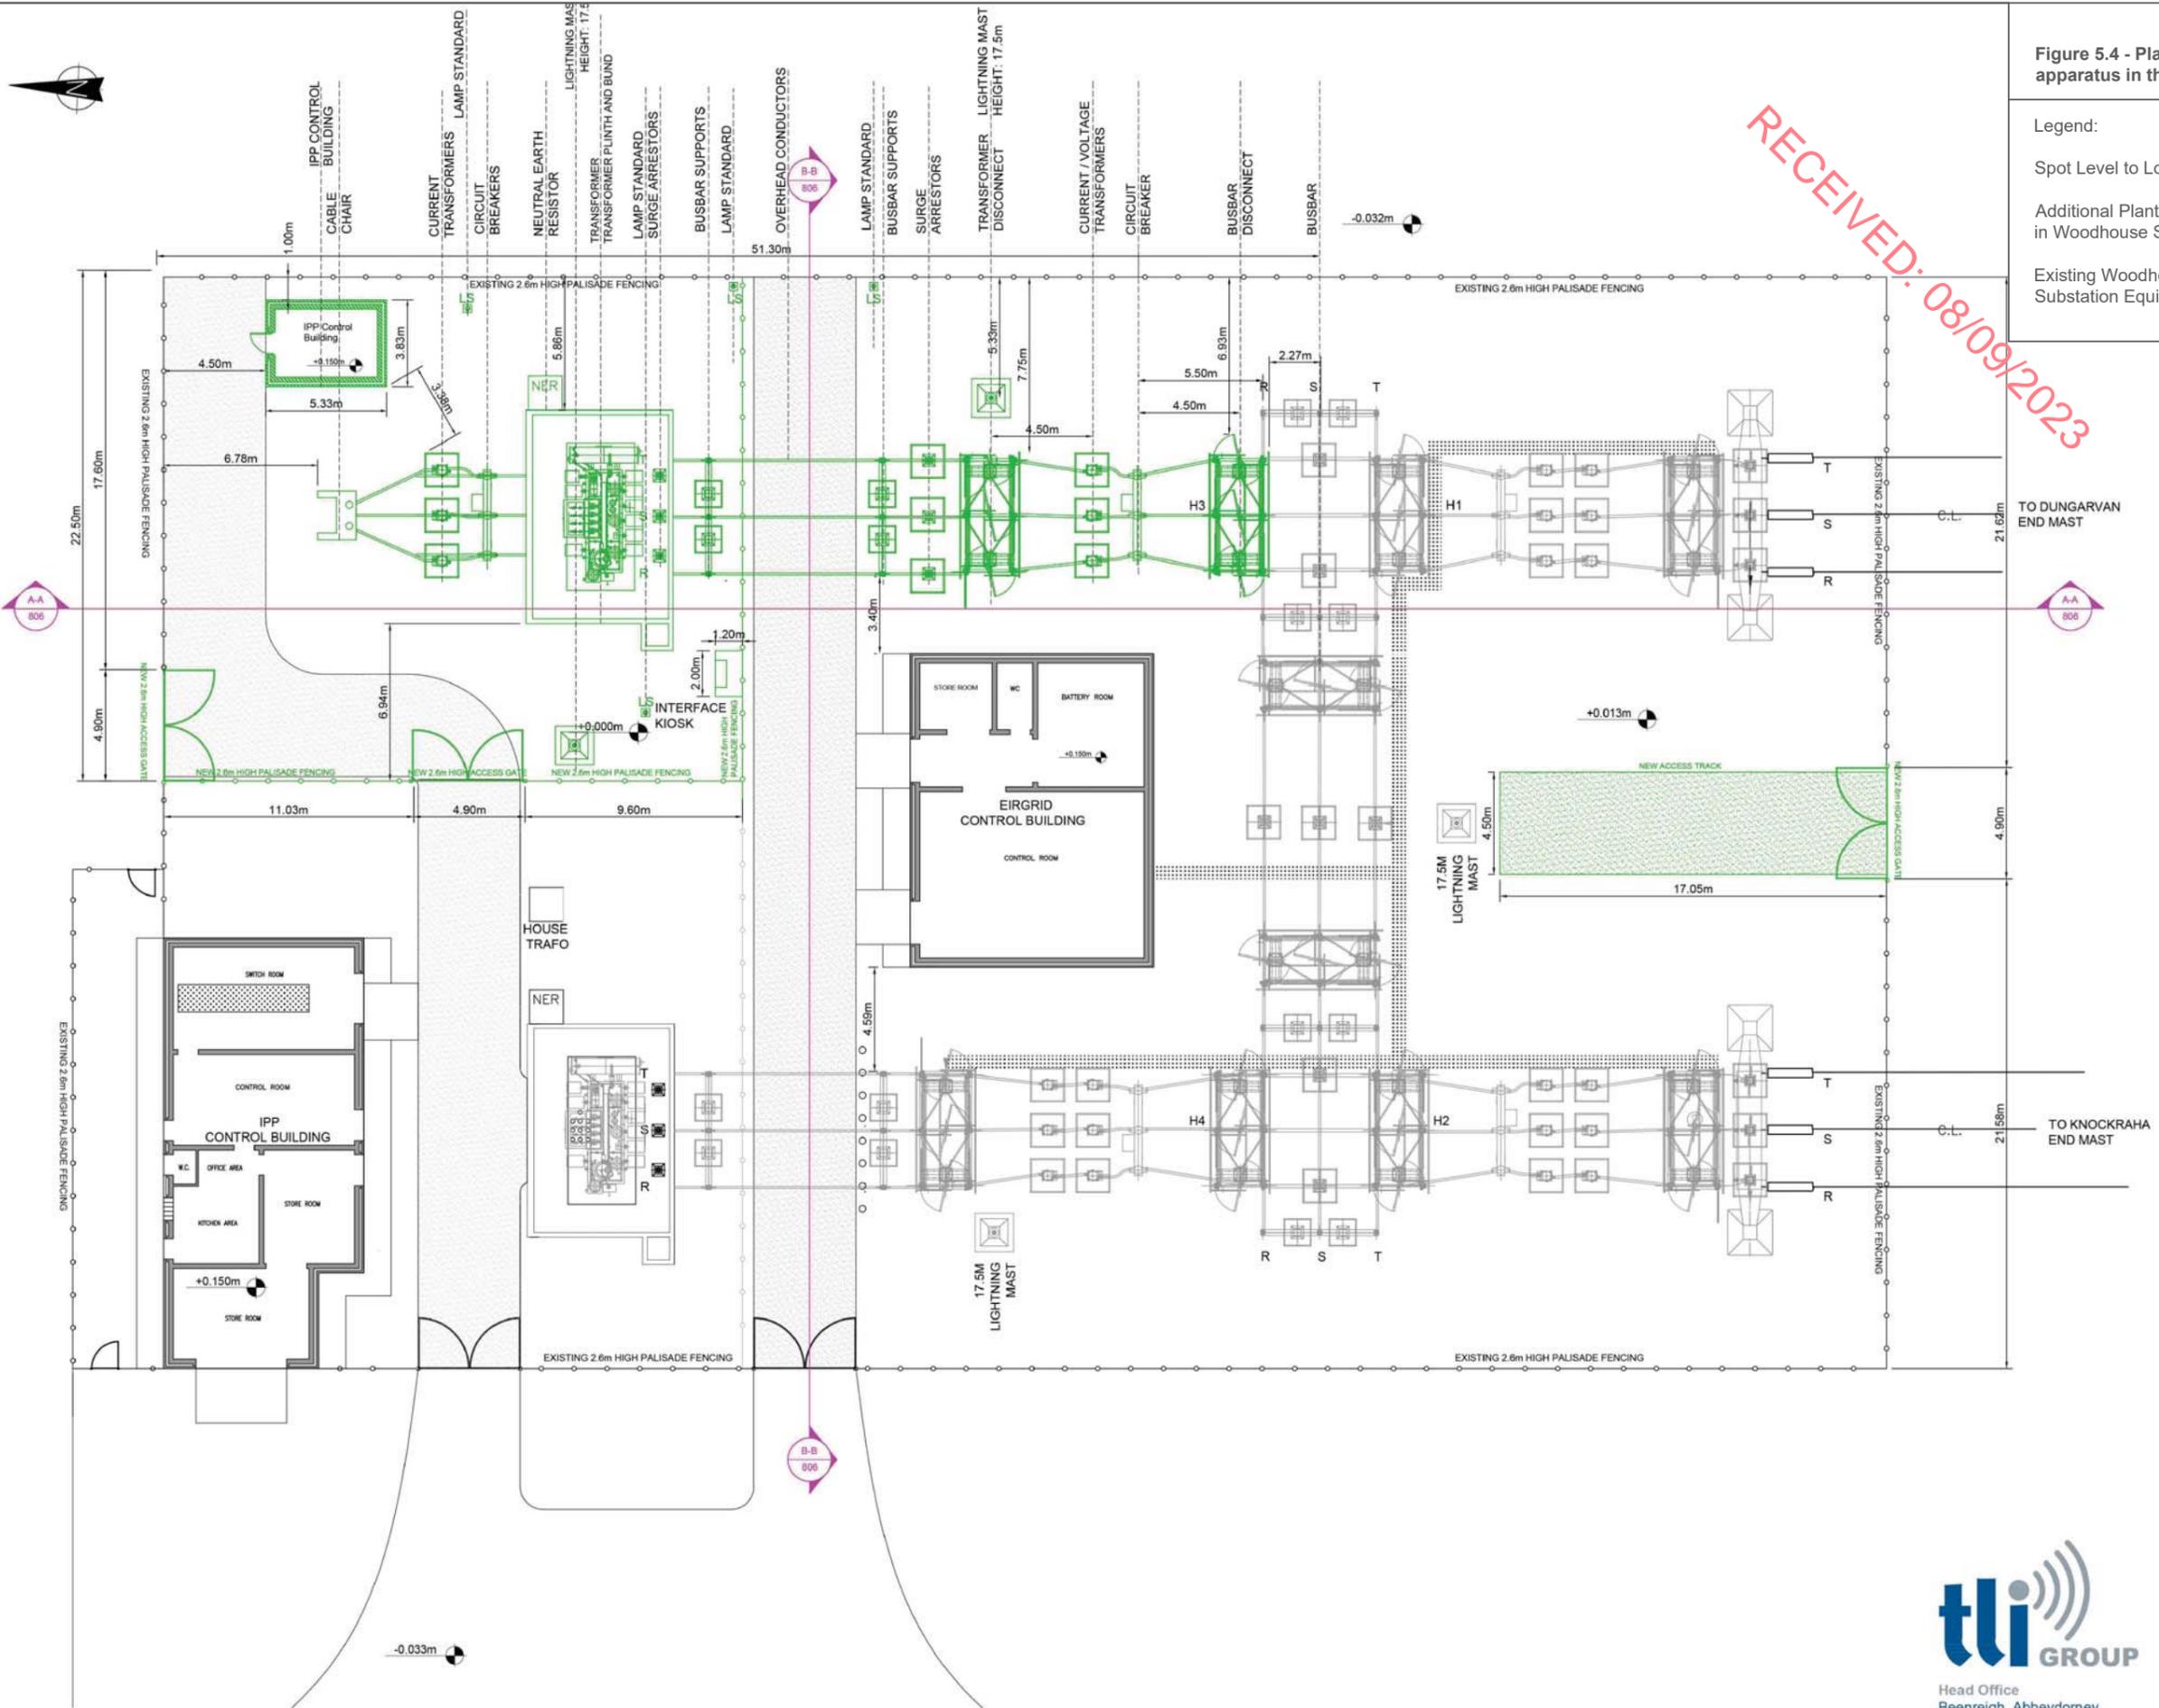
Plan of the additional plant and apparatus in the existing Woodhouse Substation
